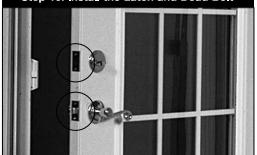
The latch and dead bolt are installed per the hardware manufacturer's installation detail.
